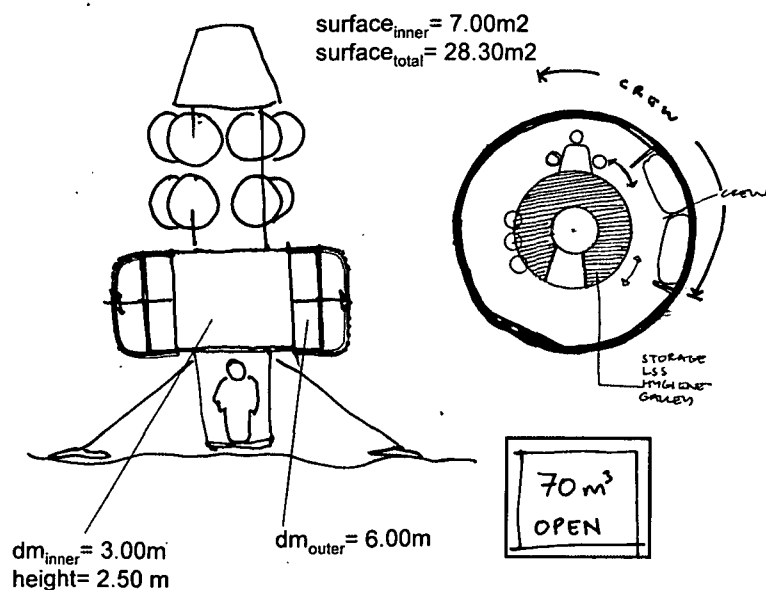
2: Sketch (left: sectional sketch, right: plan of main deck) - Option 4
